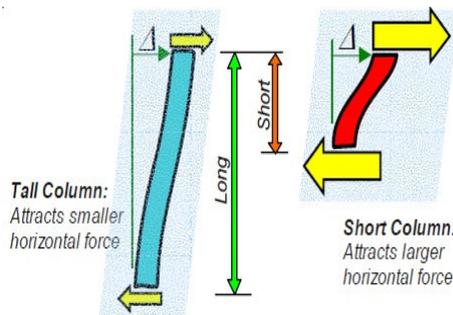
Short columns attracts shear forces more than the tall columns [2]
